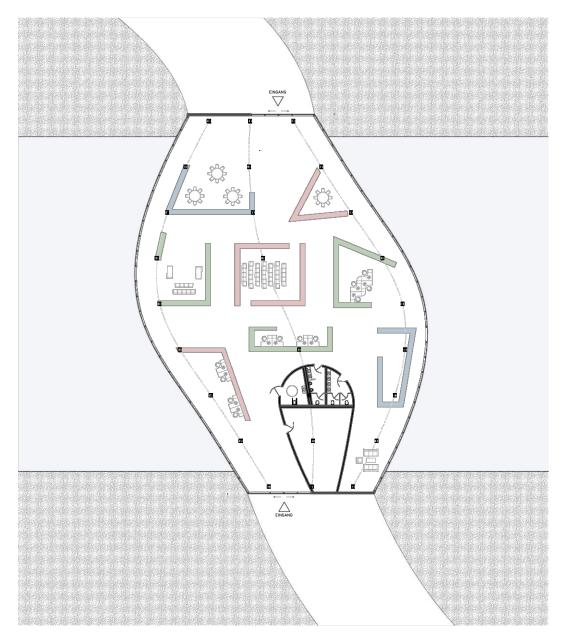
Floor plan - Building is used for workshops and seminars
